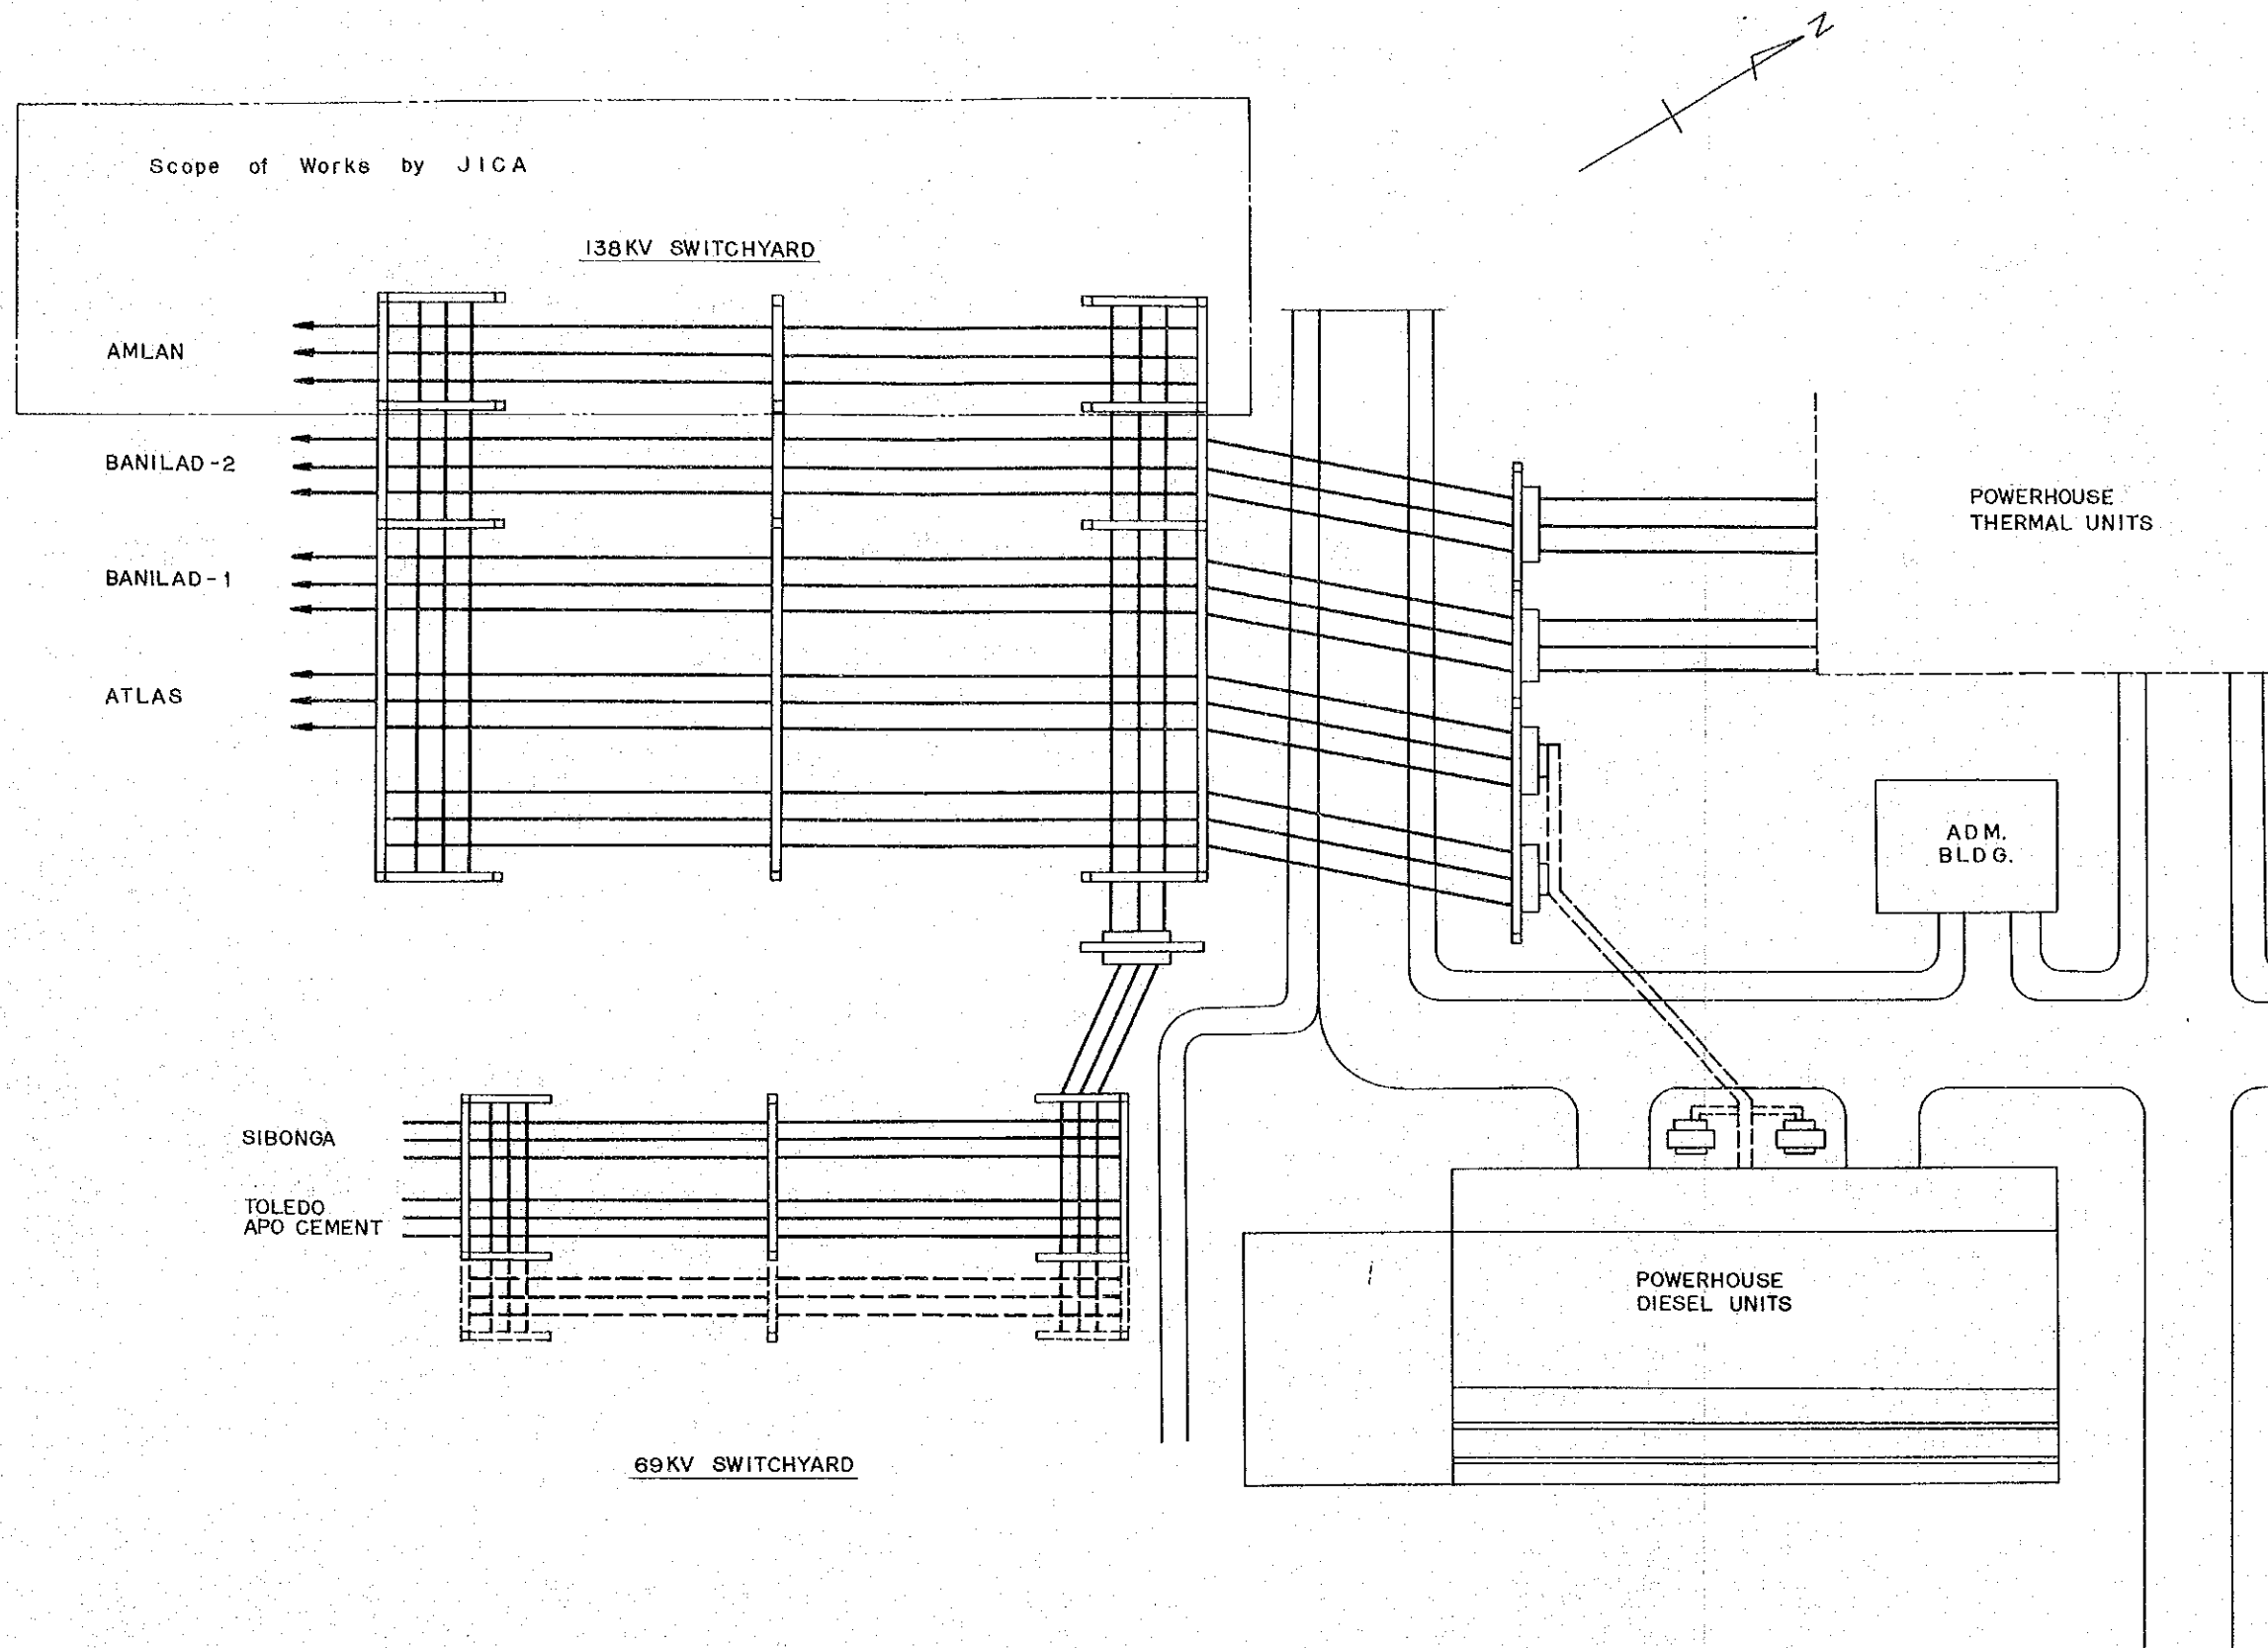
Amlan Power Plant Switchyard Enlargement Plan for 138 kV Structure (Refer to NAPOCOR Original Drawing)
